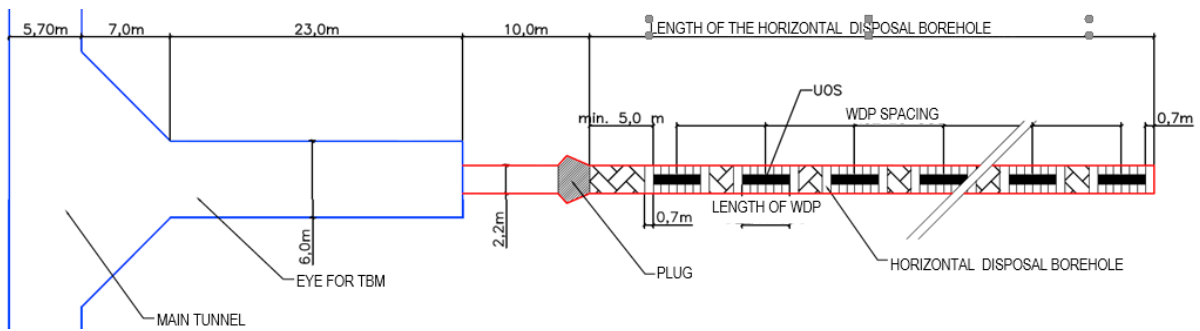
Schematic plan of horizontal disposal, prevailing conventional excavation (D4 - HD, C) Grunwald et al. 2018). Red lines = TBM tunnels, blue lines = D&B tunnels.
